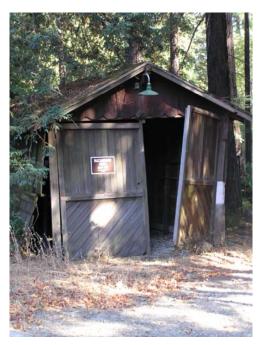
Alma College Wood Shed, existing exterior view of west façade with decorative wood shingles and framed barn-like doors. (Knapp Architects, digital photograph, 2009)
